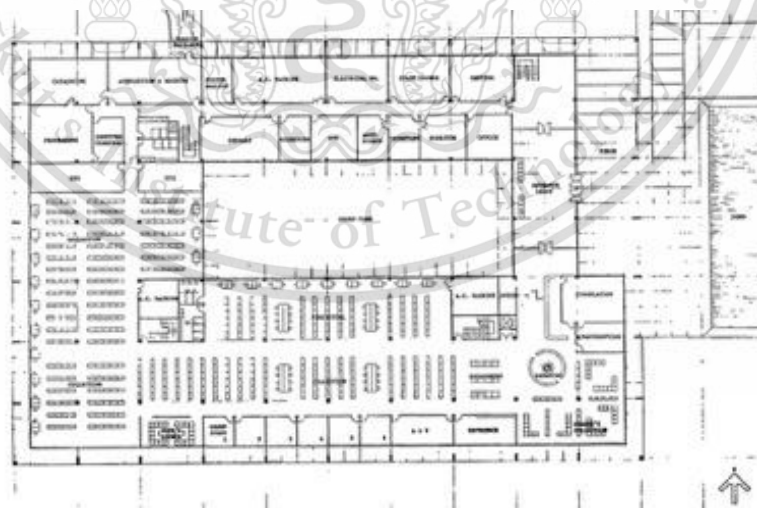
Floor Plan first of Library & Media Building AIT.
